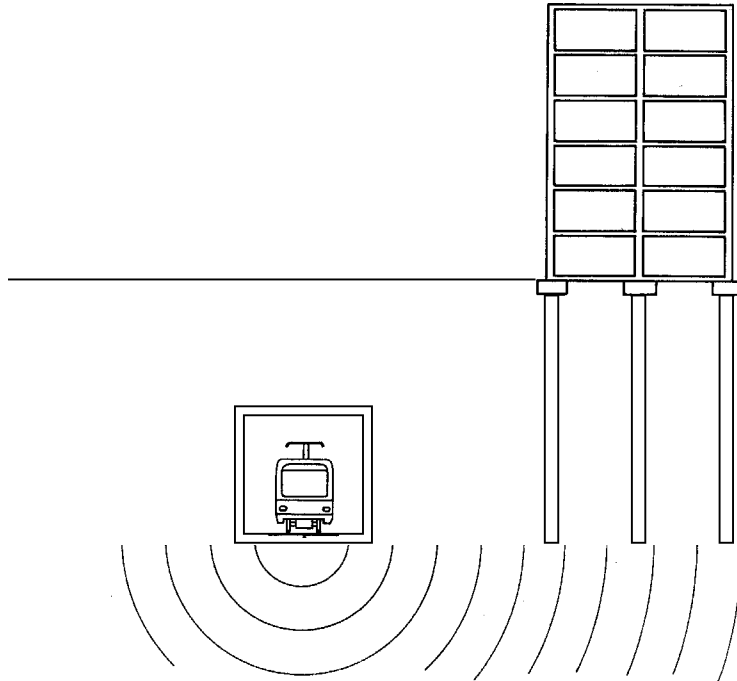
Train-induced building vibration, from the tunnel to the pile foundation into the multi-storey building.
